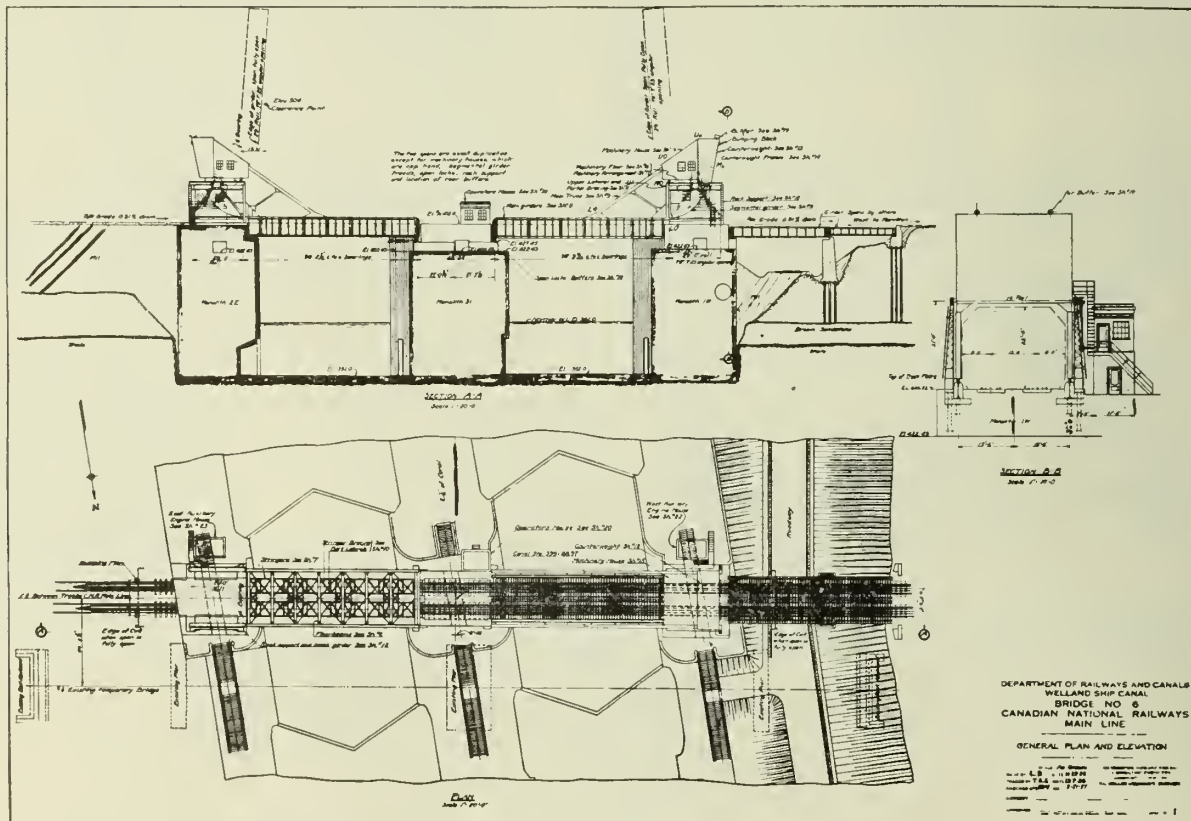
Bridge No. 6—General Plan and Elevation.
